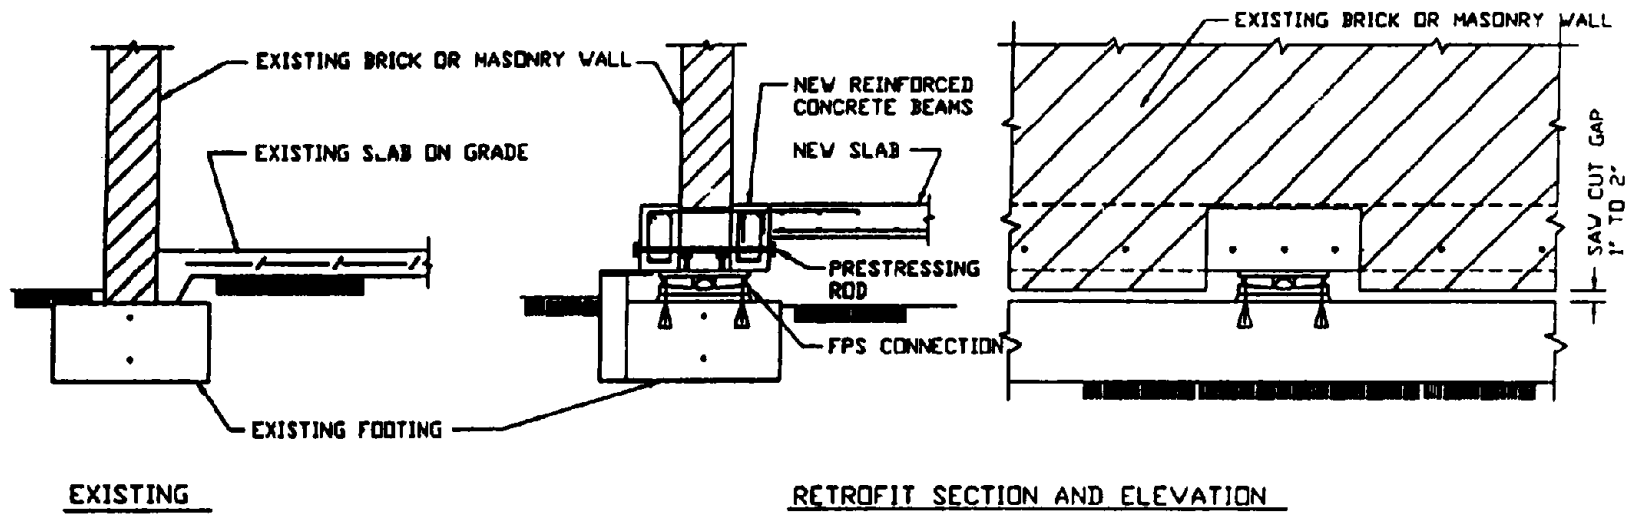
Using FPS to retrofit an existing Shear Wall Building
